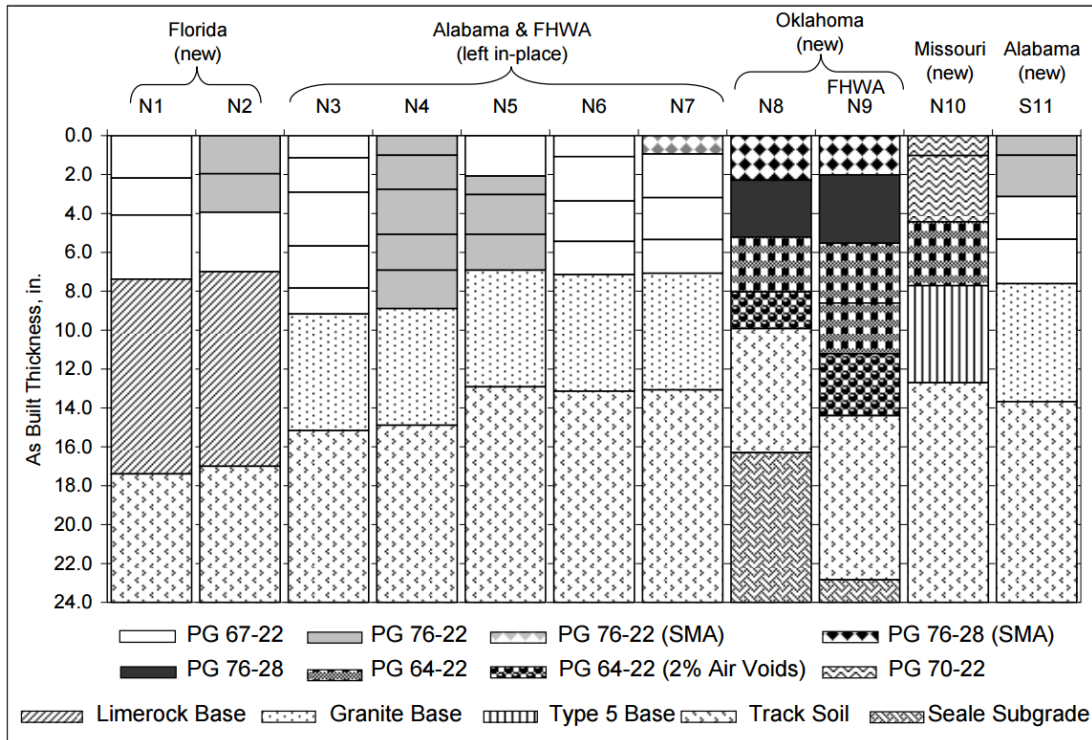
Pavement Cross-Sections in Alabama Recalibration Study (4)
